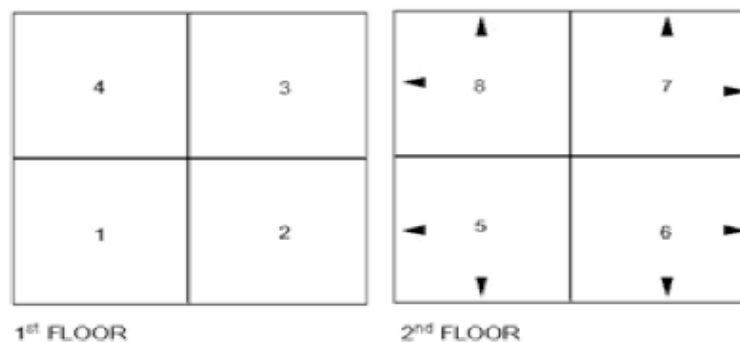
Basic layout for 1st and 2nd floors. Arrows show possible roof tilts. (Caldas and Norford 2003)
